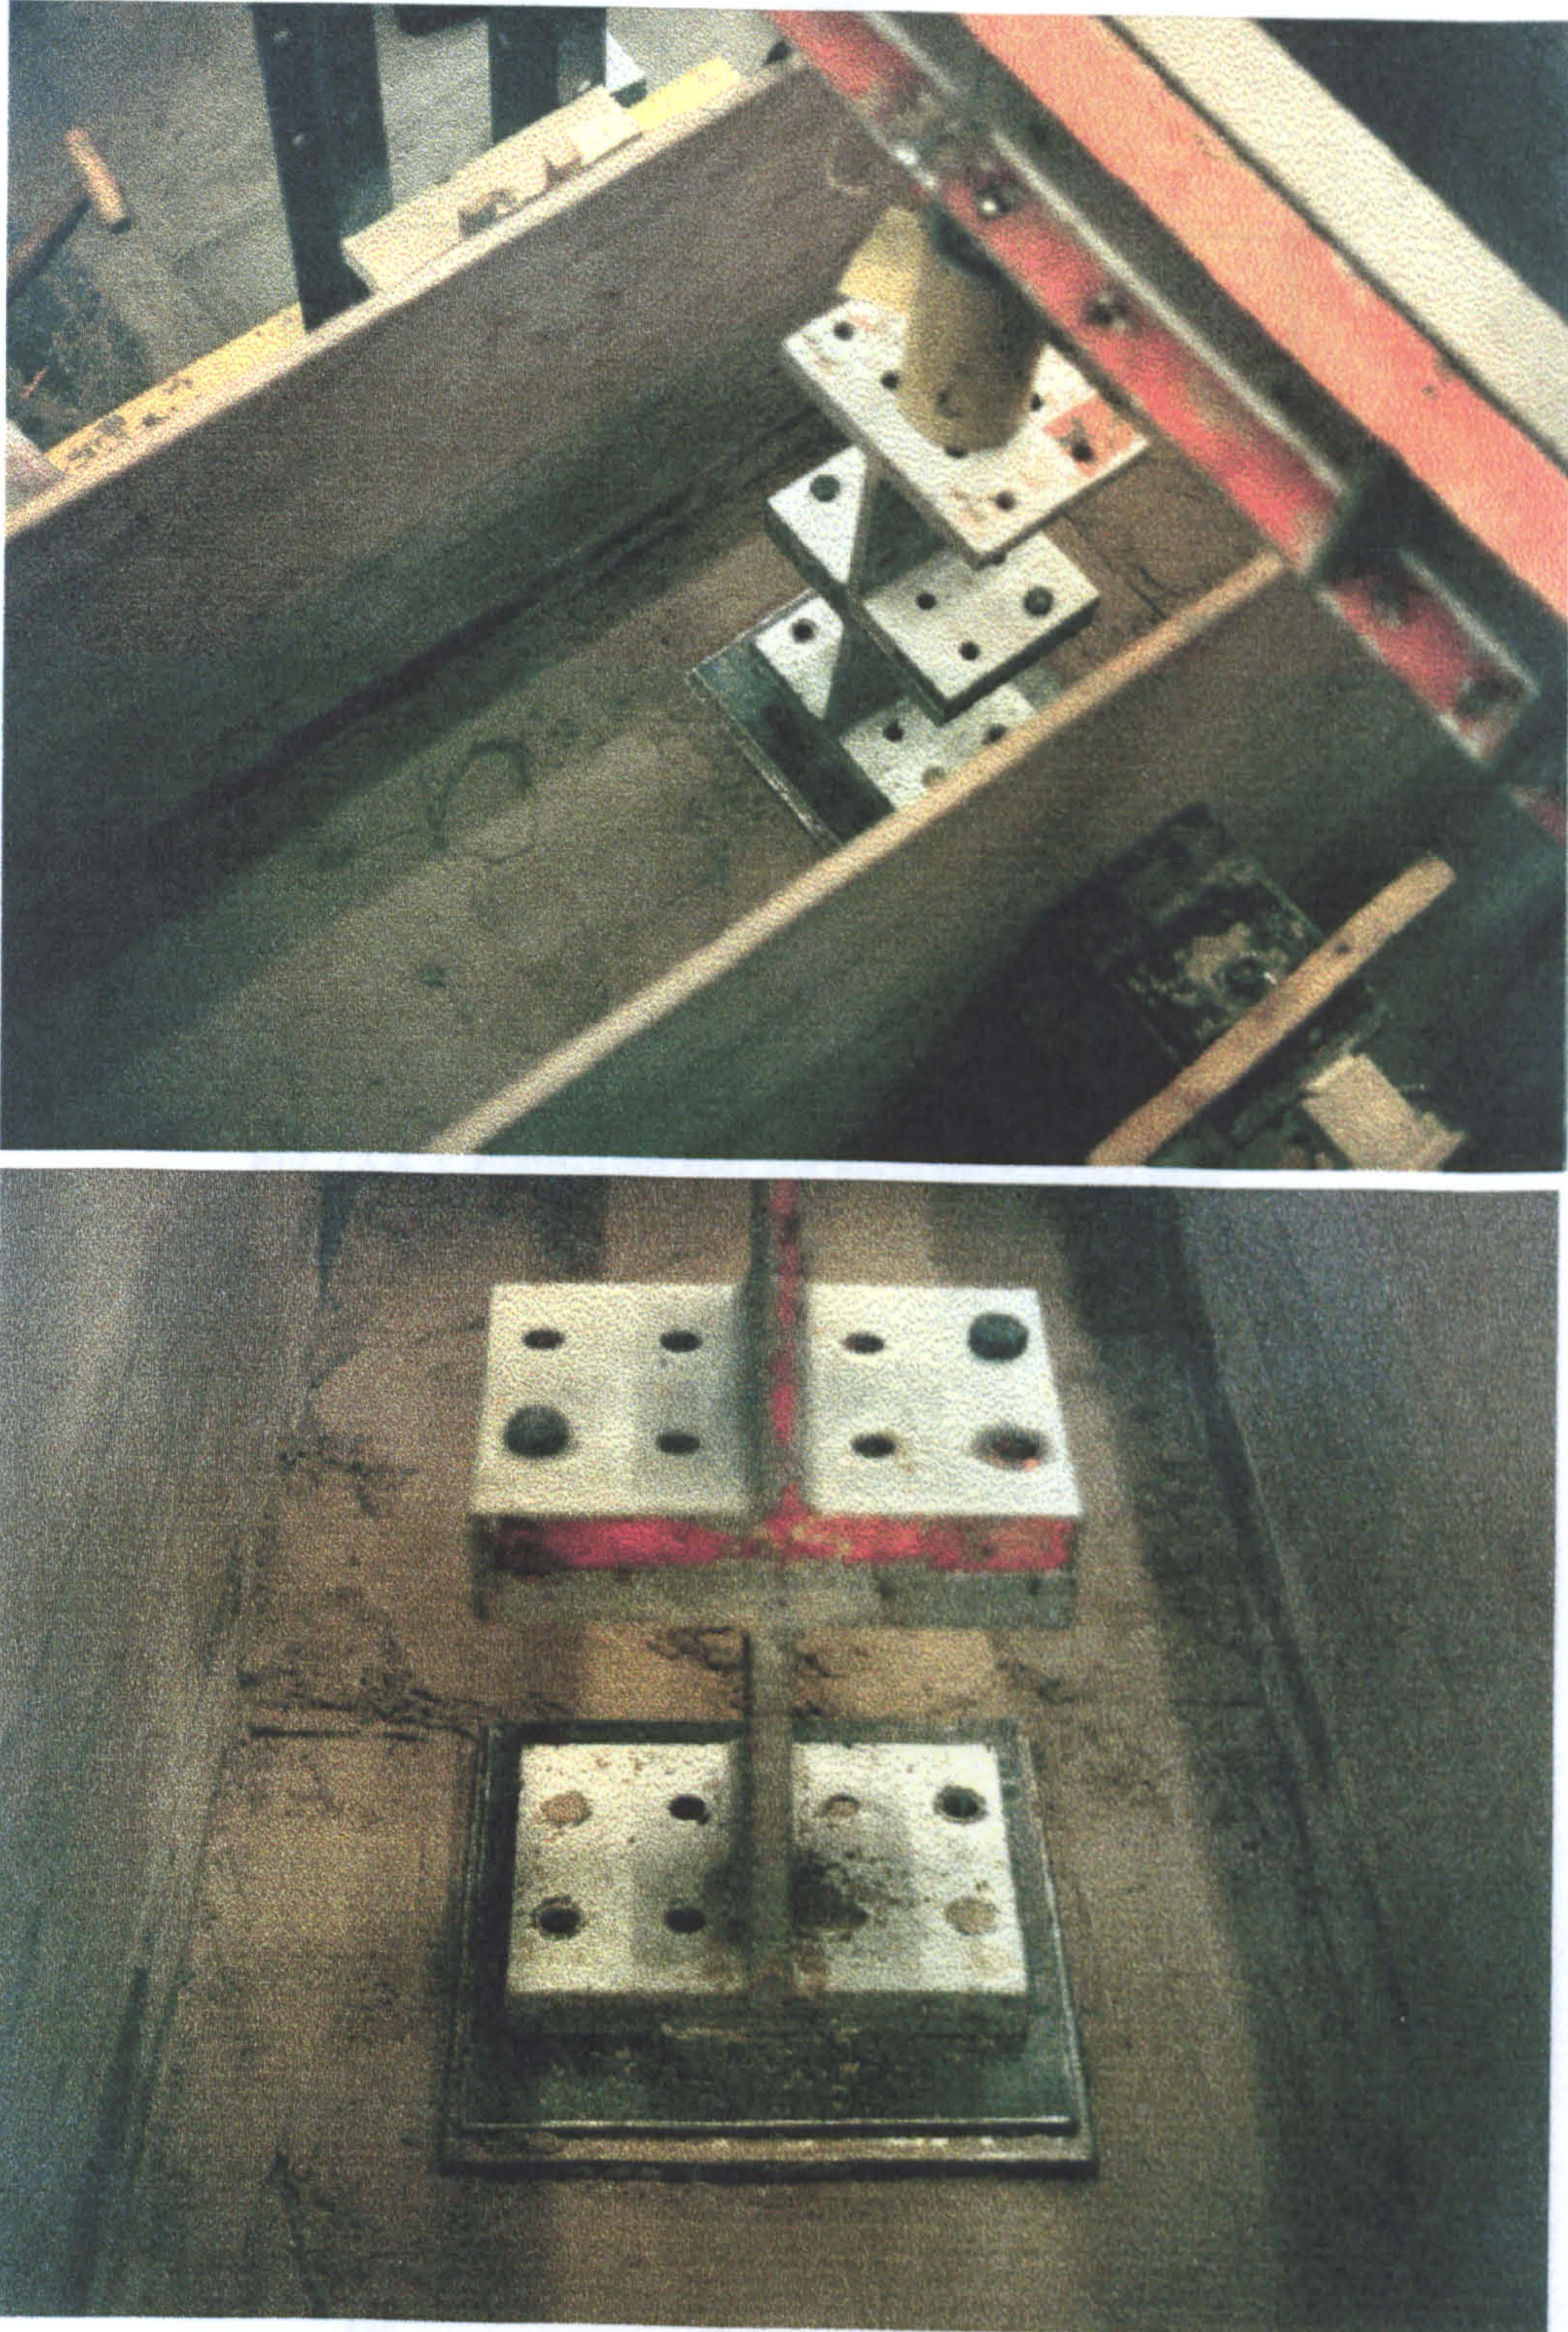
Plate-load test showing the stacked plates and I-sections.
